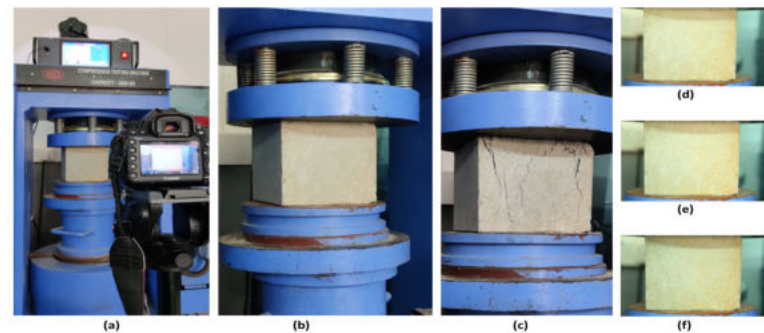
Compressive strength testing of concrete cube in the laboratory (a) Test setup with recording (b) Application of load (c) Fully tested cube (d) Initial specimen (e) First crack appearance (f) Full crack formation
